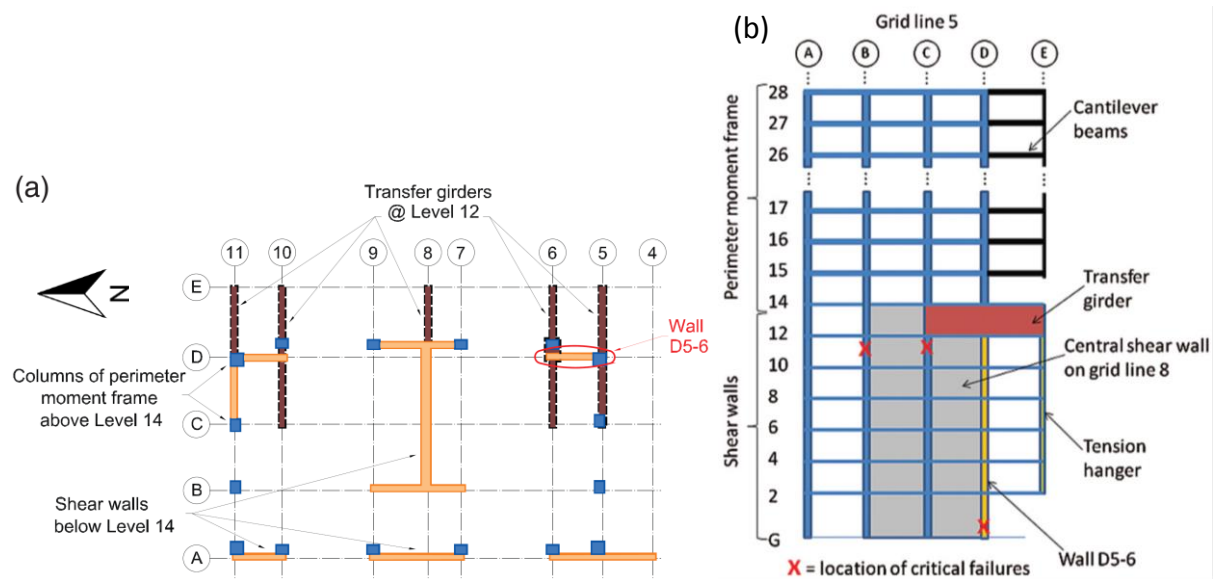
GCH structural layout sketch (a) plan and (b) elevation along grid line 5 (Elwood 2013)
